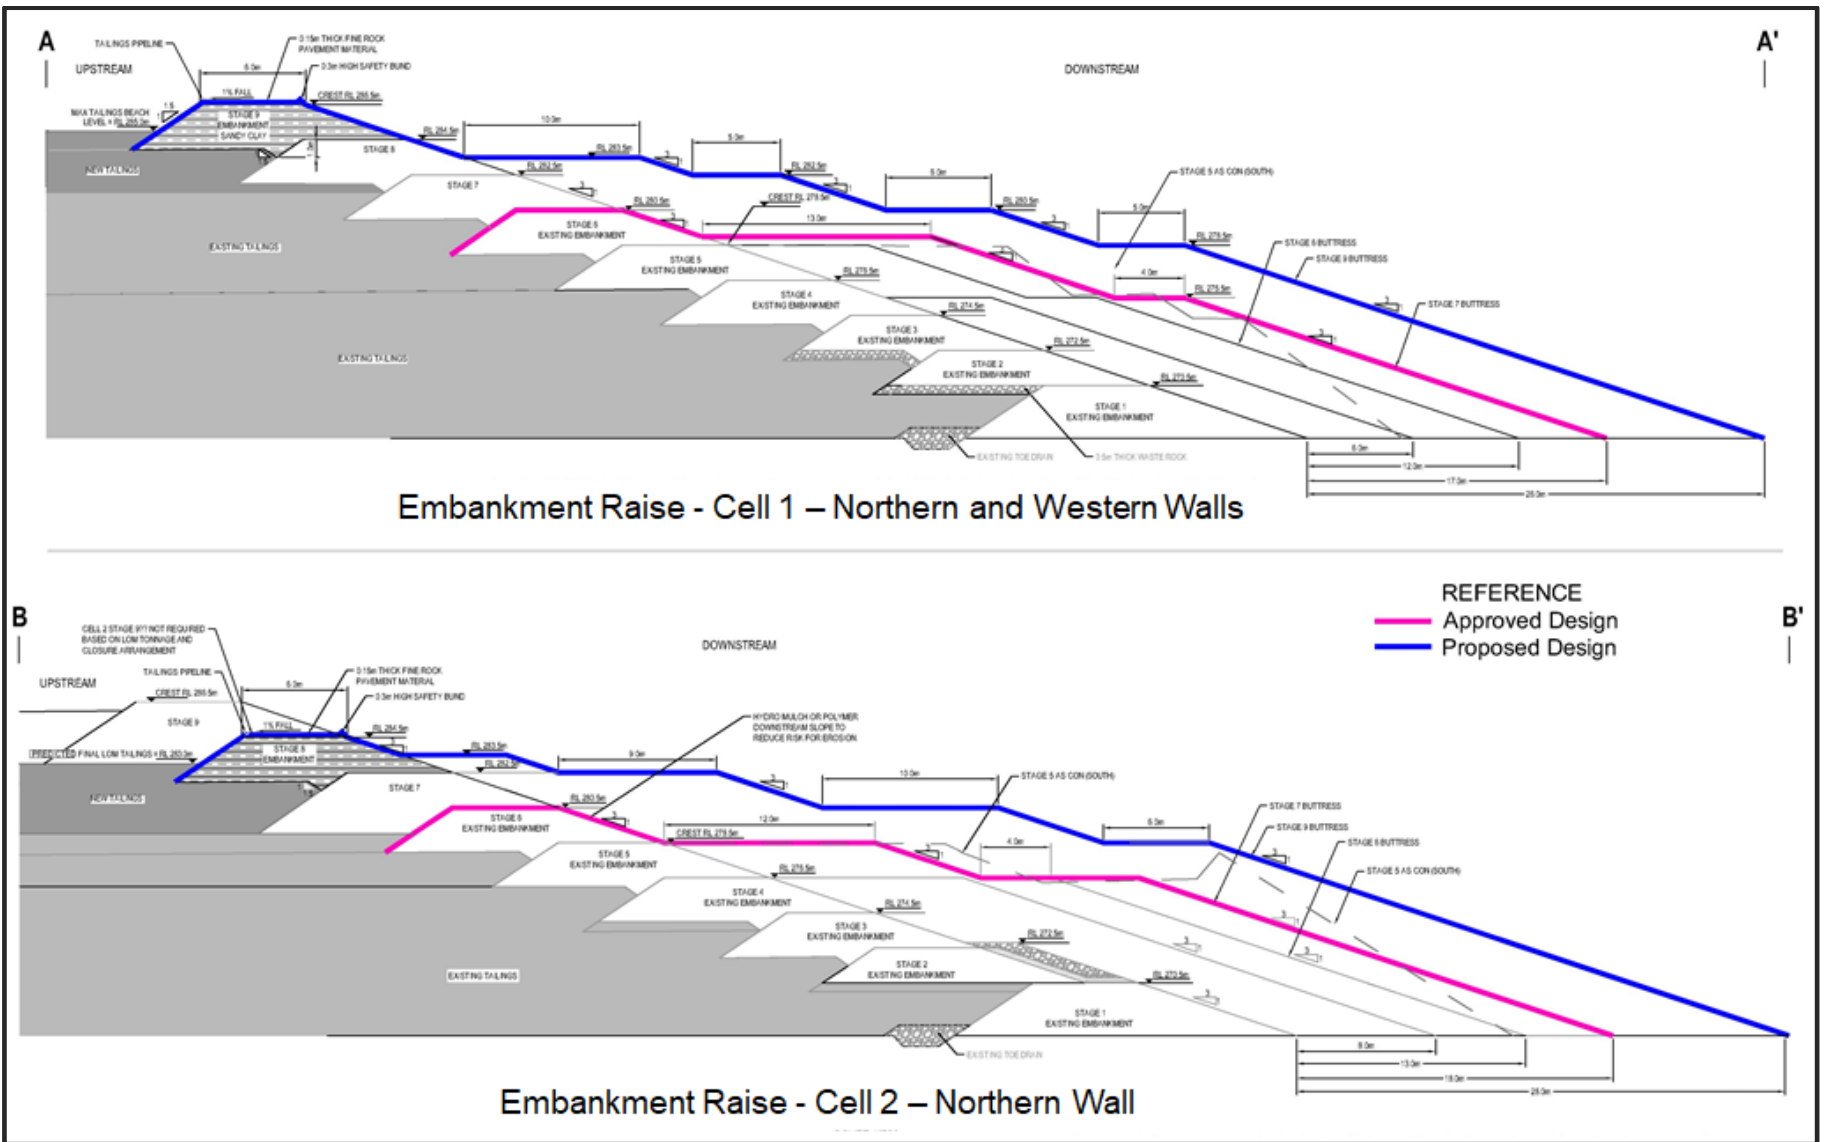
| Proposed RSF Embankment Raise, Northern and Western Cross-Sections – Concept Design (Source: Tomingley Gold Operations Pty Ltd)
